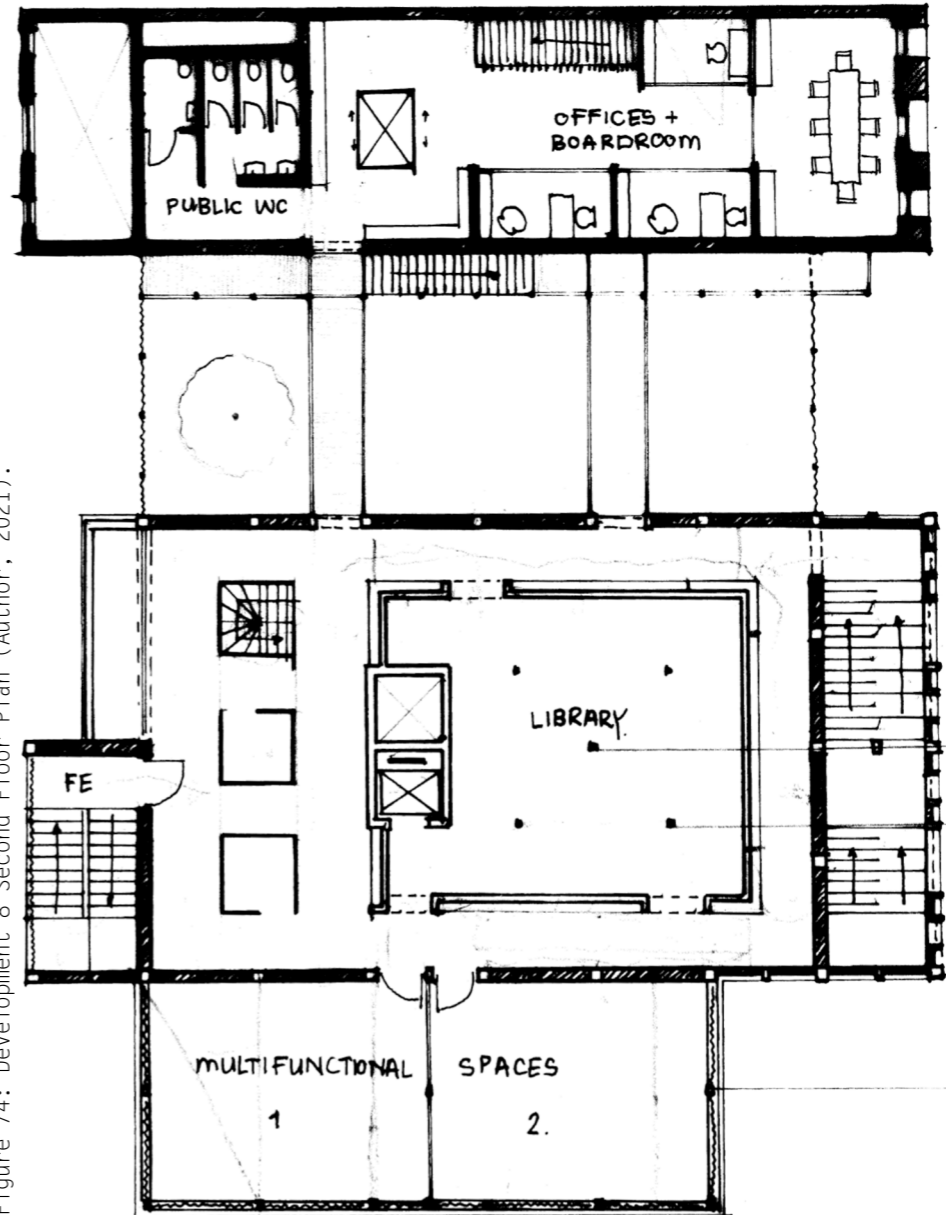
Development 8 Second Floor Plan (Author, 2021).
